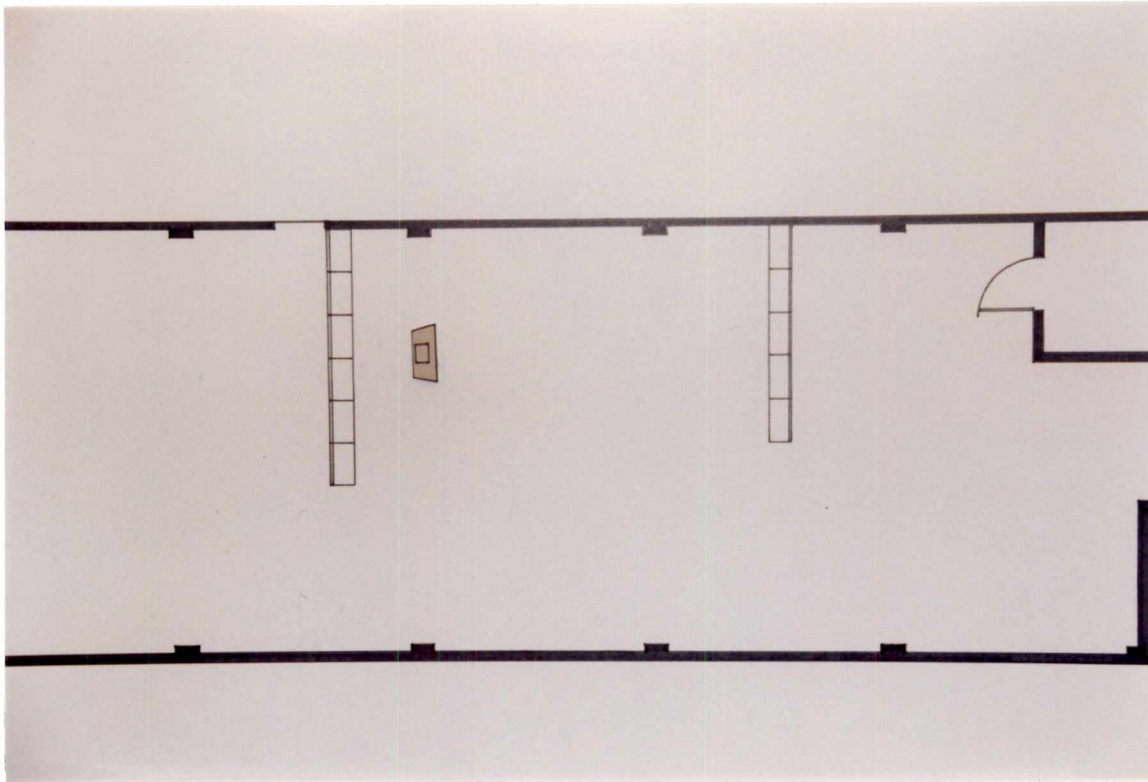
Photograph of Two Dimensional Drawing with Two Dimensional Furniture Components.
